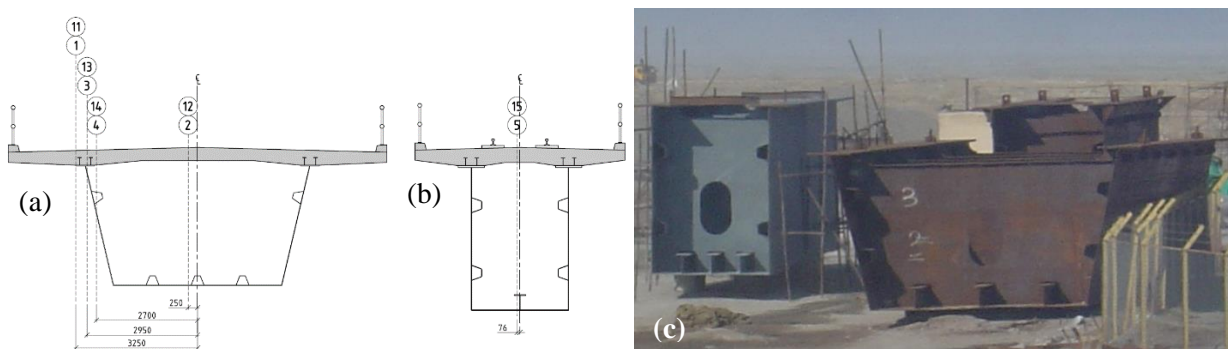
Trapezoidal cross section bridge deck model with different length to width ratio (5,7.5, 10 and 12.67)
